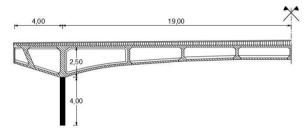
Longitudinal cross-section of the reinforced-concrete Tudor Vladimirescu bridge, Iași.
